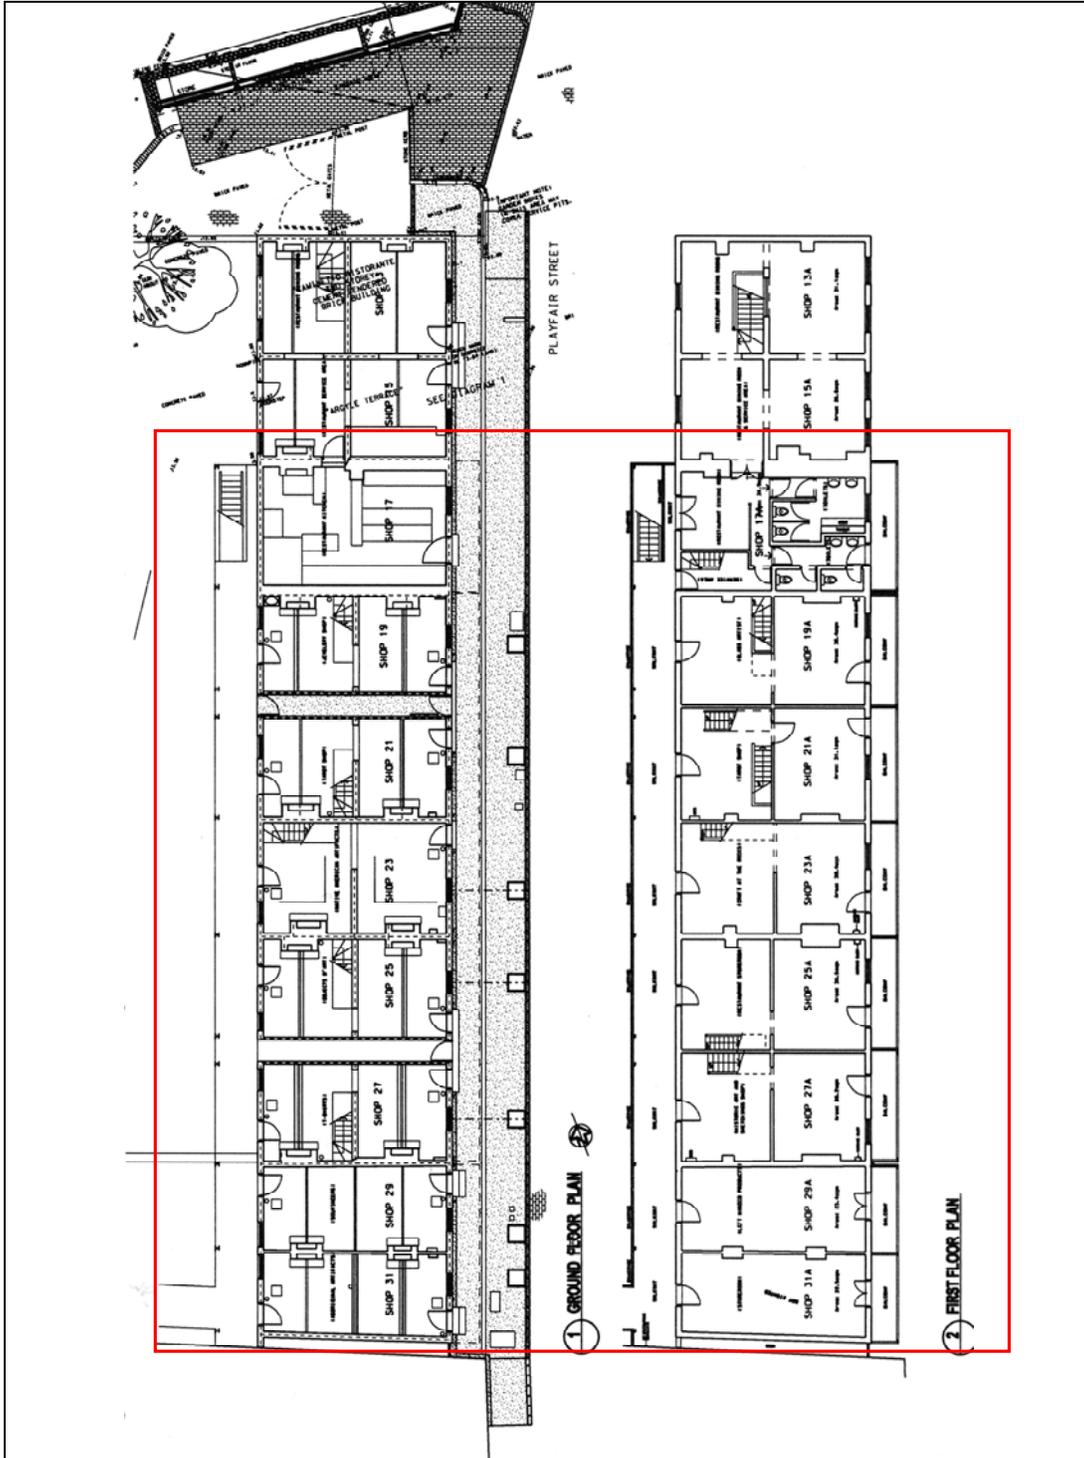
Ground and First Floor Plans (Source: Foreshore Authority, July 2003).
